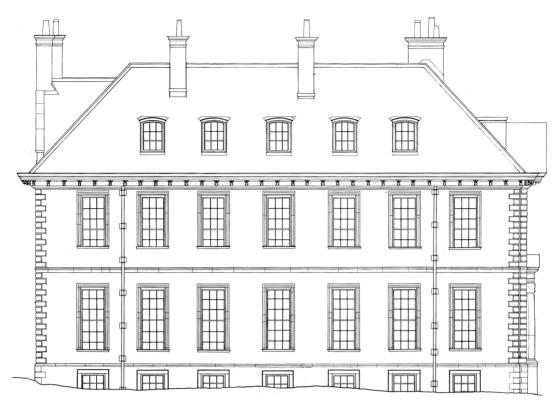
The original arrangement of the west elevation, as reconstructed from the available evidence.
